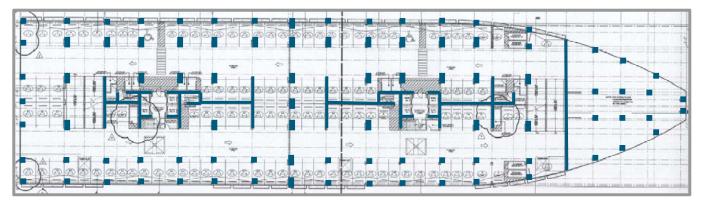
Column and Shear Wall Layout for Typical Parking Garage Level
